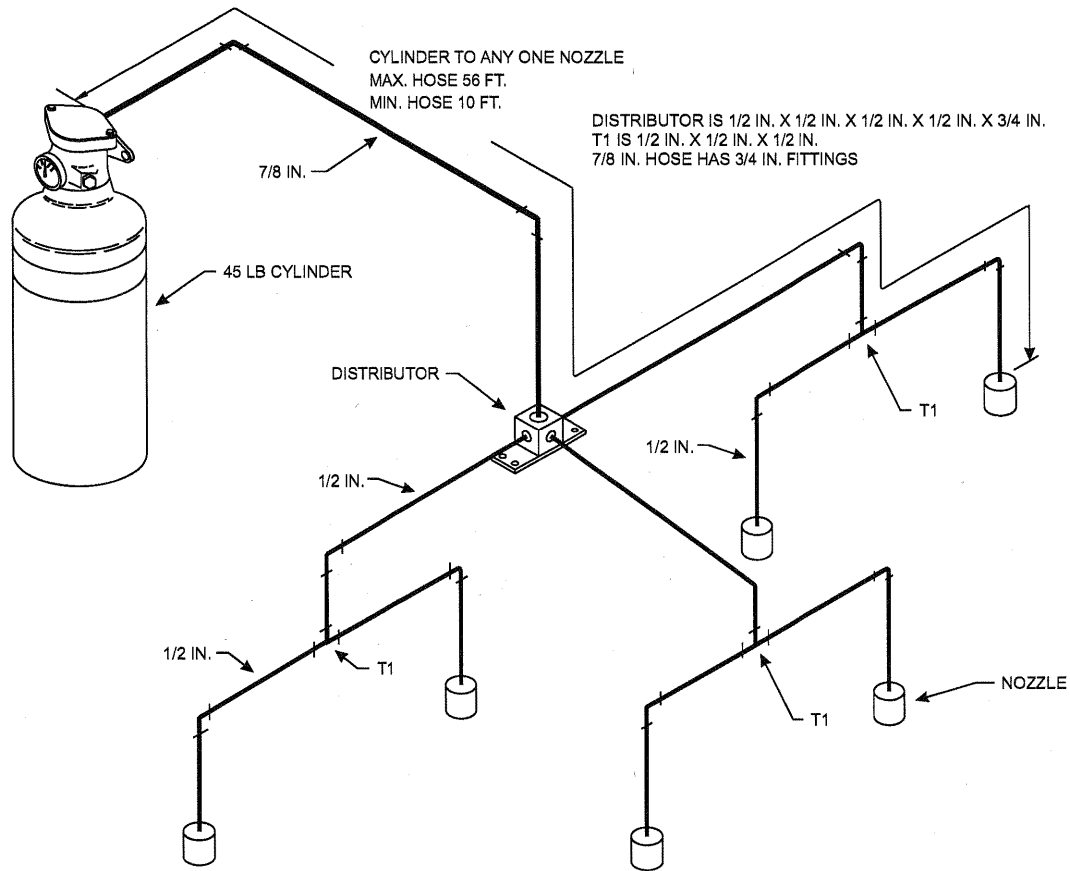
IND-45, Six-Nozzle System, Using a Distributor
